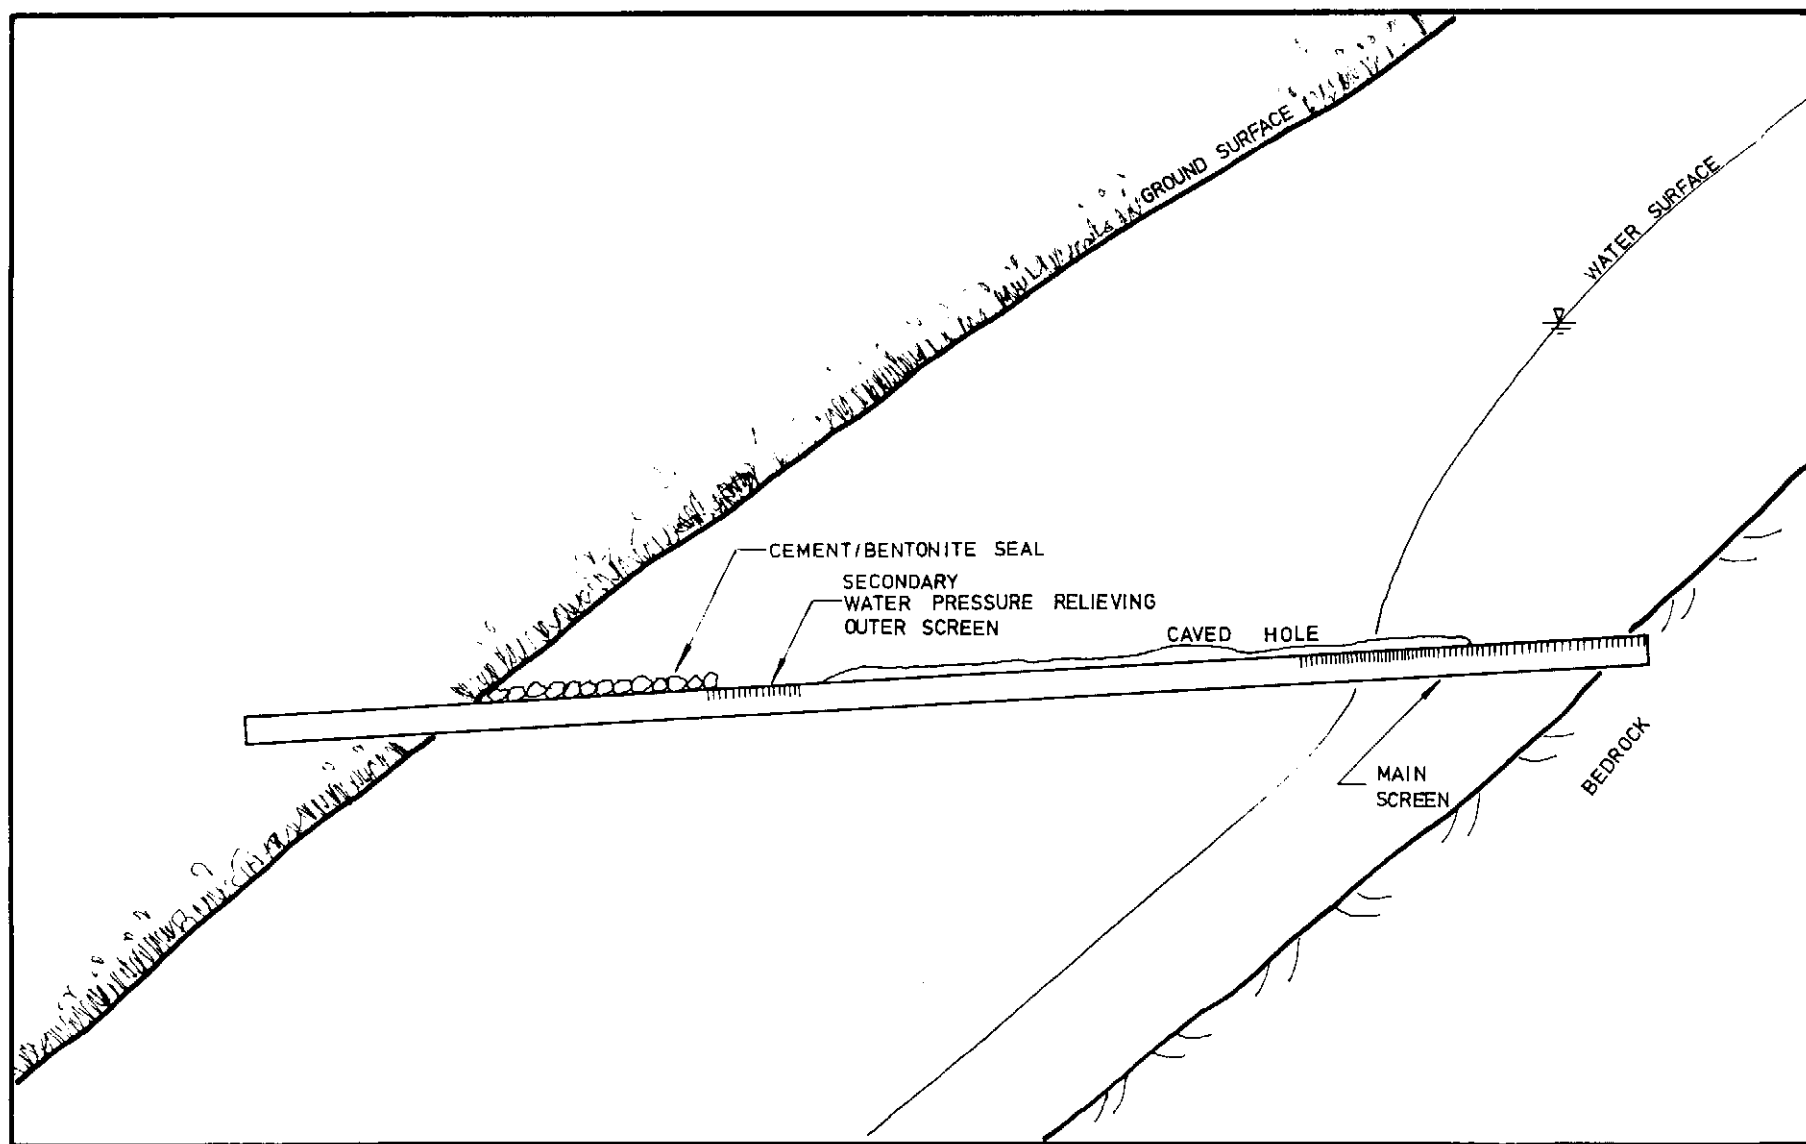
Non-grouted Horizontal Drain with Secondary Water Pressure Relieving Screen
